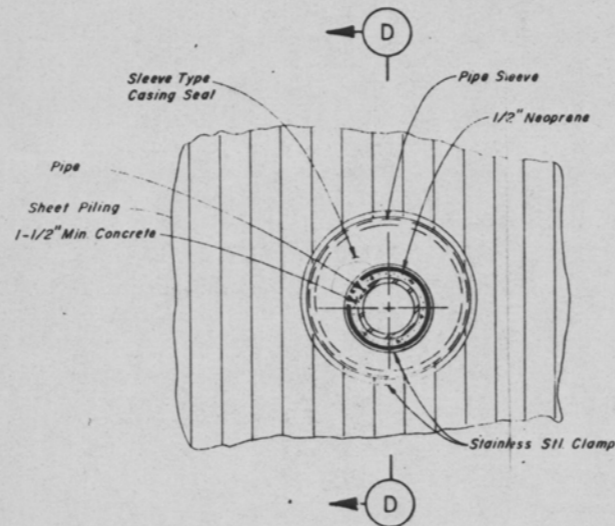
DETAIL PIPE LESS THAN 12" DIA THRU STEEL SHEET PILING (3)
